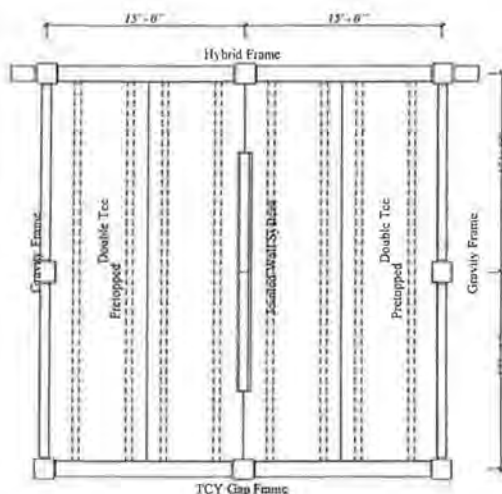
Floor plan of the test building at Levels 1 - 3.
